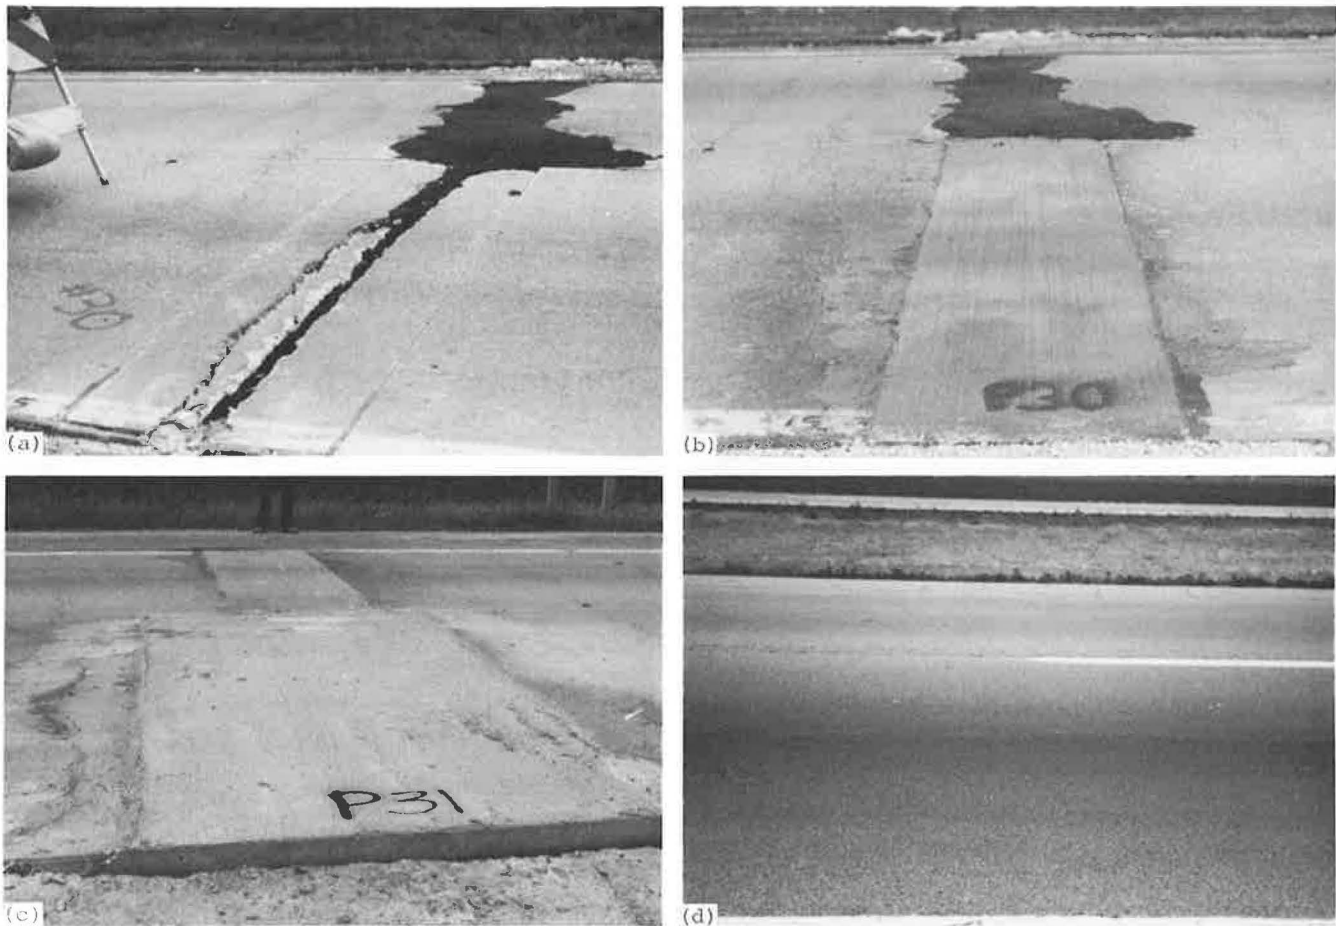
Performance of welded full-depth repairs. (a) Deteriorated construction joint before repair. (b) Welded repair P30 placed in outer lane. (c) Welded repair P31 placed in inner lane. (d) No reflection cracking in overlay in 1988.
